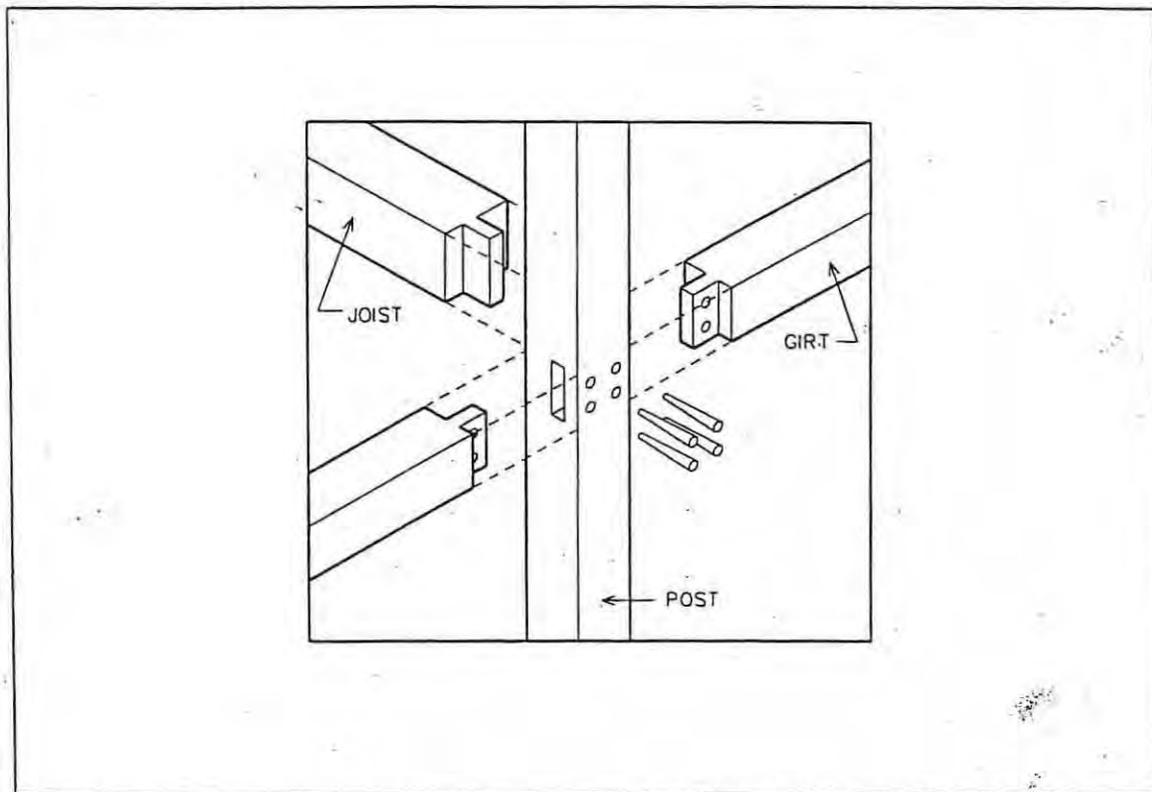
Dutch House. Detail of typical post-girt-joist assembly.
